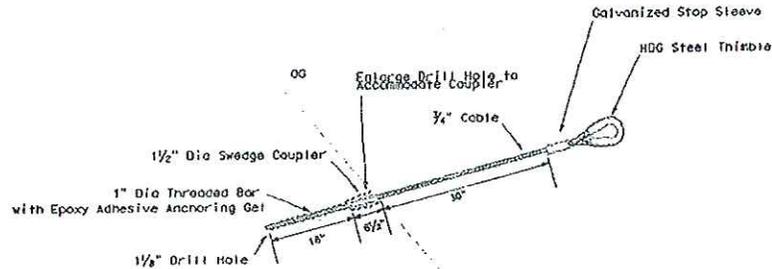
Typical Schematic of Resin Grouted Cable/Rod Ground Anchor
